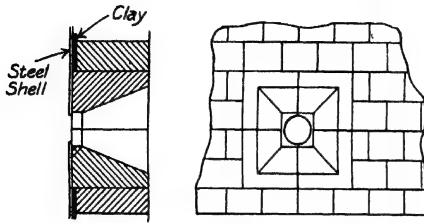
DETAILS OF POKING HOLE BLOCKS ON PRODUCER CASING.
